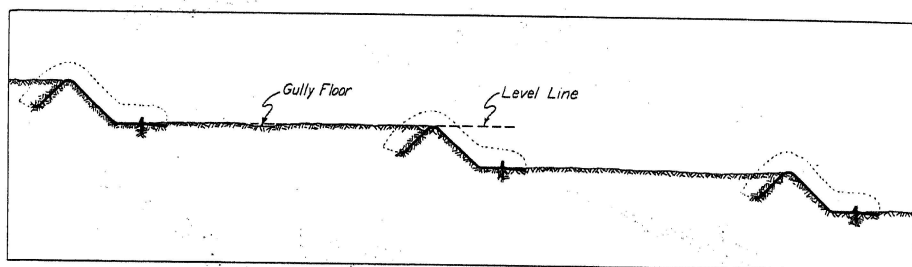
Cross section view of Missouri dams used in a series to give complete mechanical protection in a gully or terrace outlet. A combination of grassed outlet and structures is usually preferable to complete control by structures.
